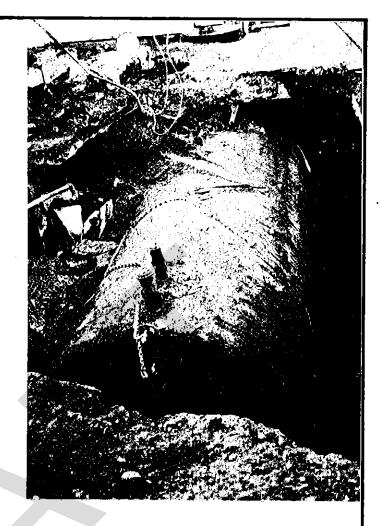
Site Location: South side of S.W. 1st Avenue Direction Faced: South Showing: Tank #1
